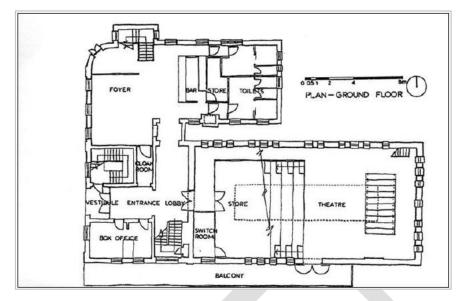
Ground Floor plan, showing the configuration of the building in 1990. (Source: Bligh Robertson Architects, Sydney Sailor's Home (former) (106-8 George Street) Conservation Plan, (Feb 1990))
